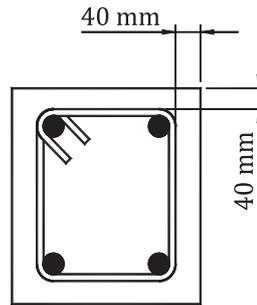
All types of reinforcement of girders, beams, or columns, when not exposed to weather or in contact with ground (Minimum concrete cover: 40 mm)
